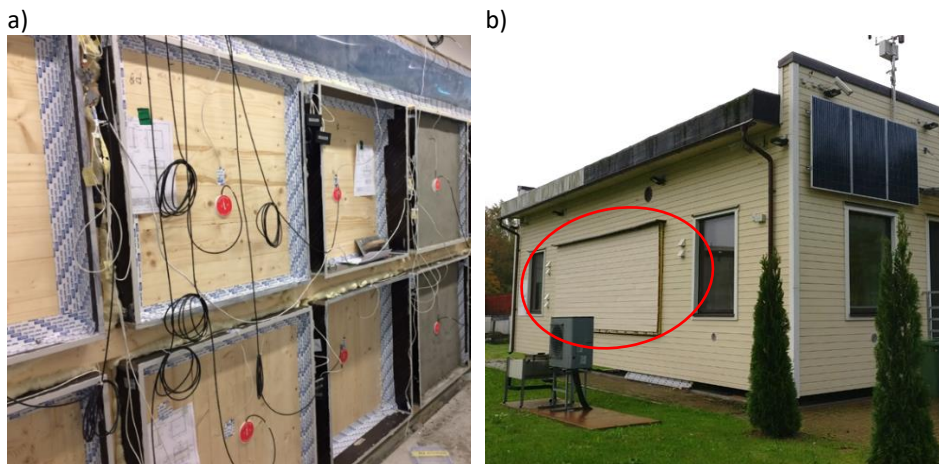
Test walls installed as part of the external wall of the TalTech nZEB test facility, interior view (a) and exterior view (b, marked with a red circle).
